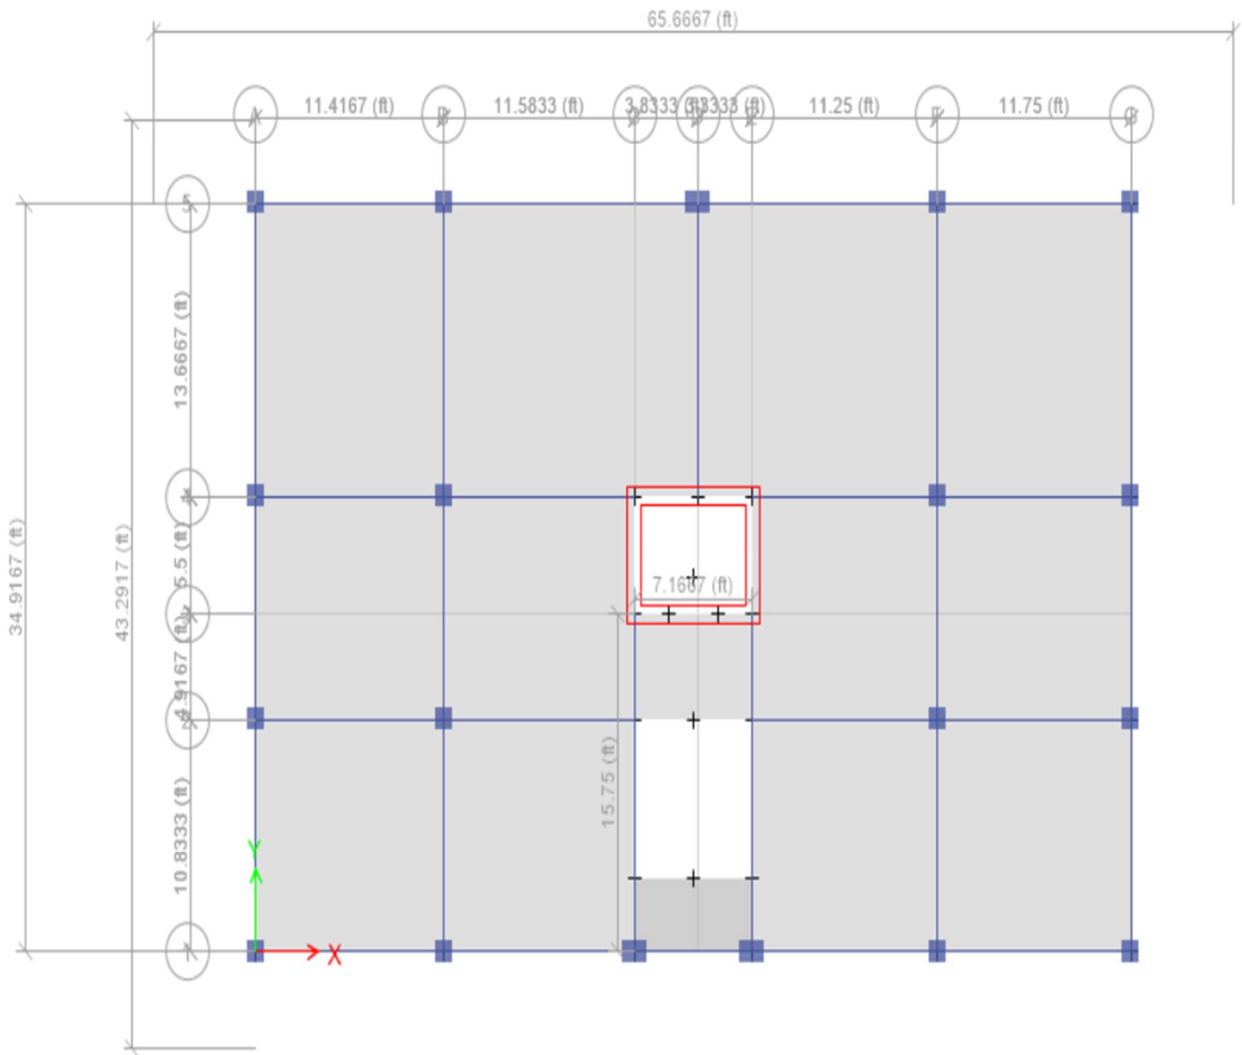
FLOOR PLAN (GROUND FLOOR & ROOF)
